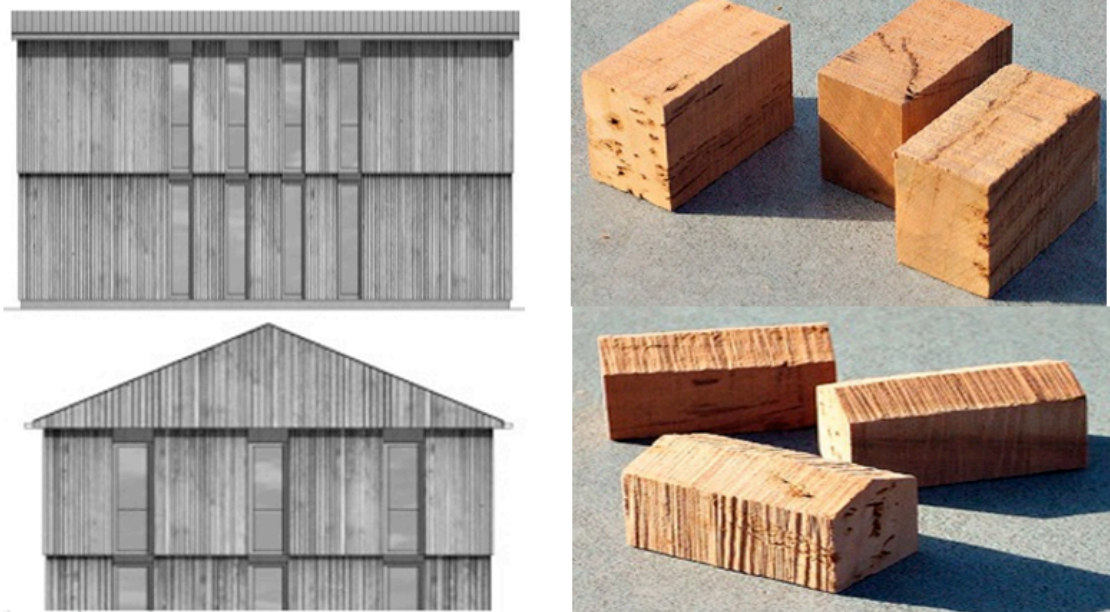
Housing patterns in wooden constructions (left) and the first models with the scale 1:200 (right).
